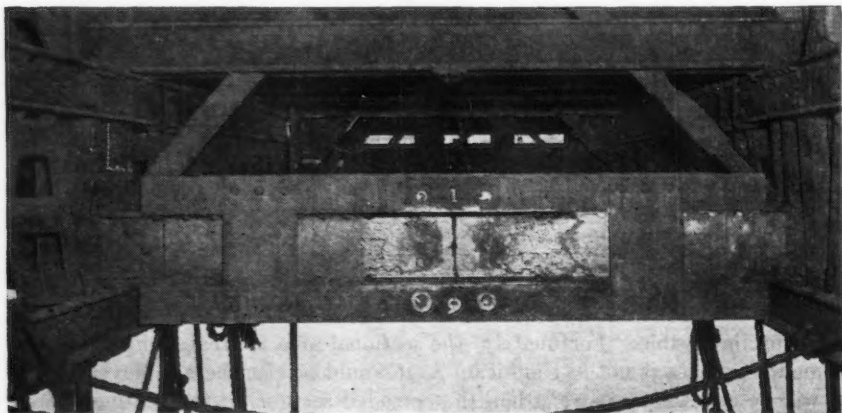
BOTTOM CHORD OF STIFFENING TRUSS WITH AUXILIARY CHANNELS IN PLACE
